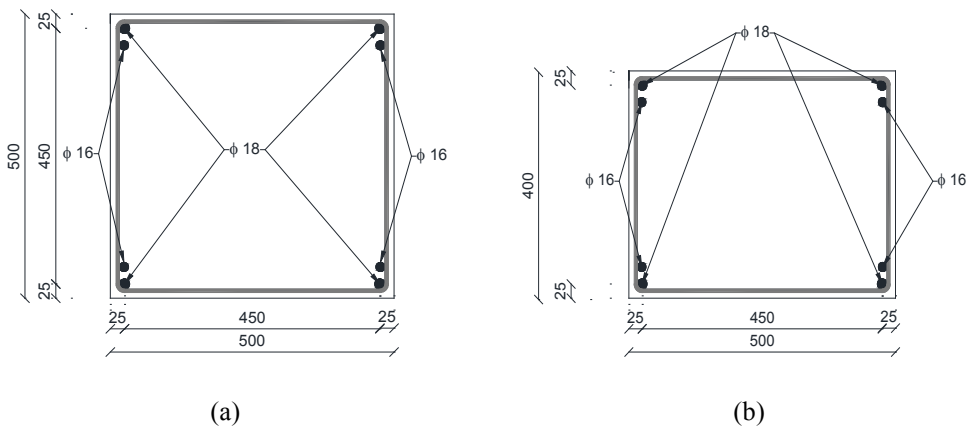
Cross sections of column for (a) columns B,D and E and for (b) columns A and C
